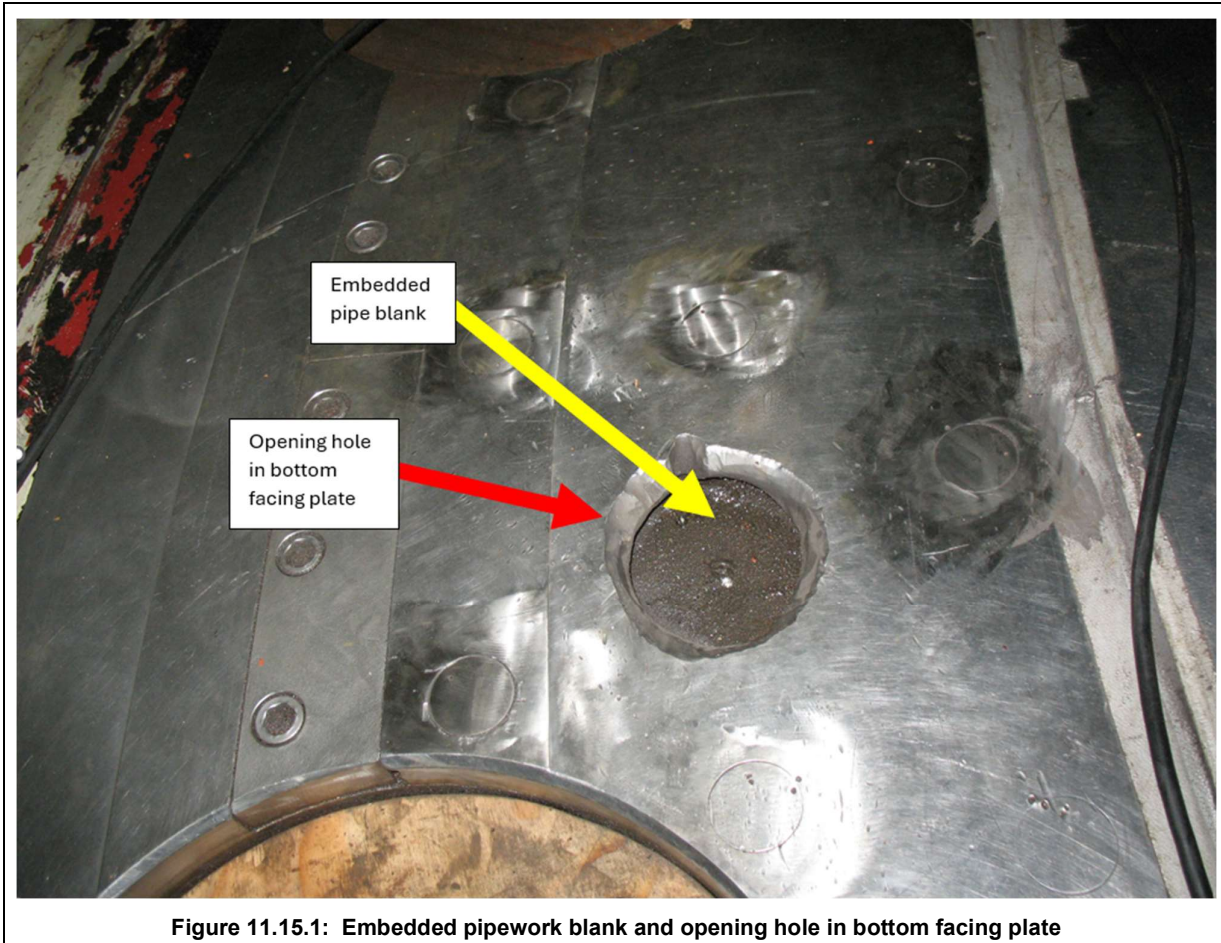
Embedded pipework blank and opening hole in bottom facing plate
